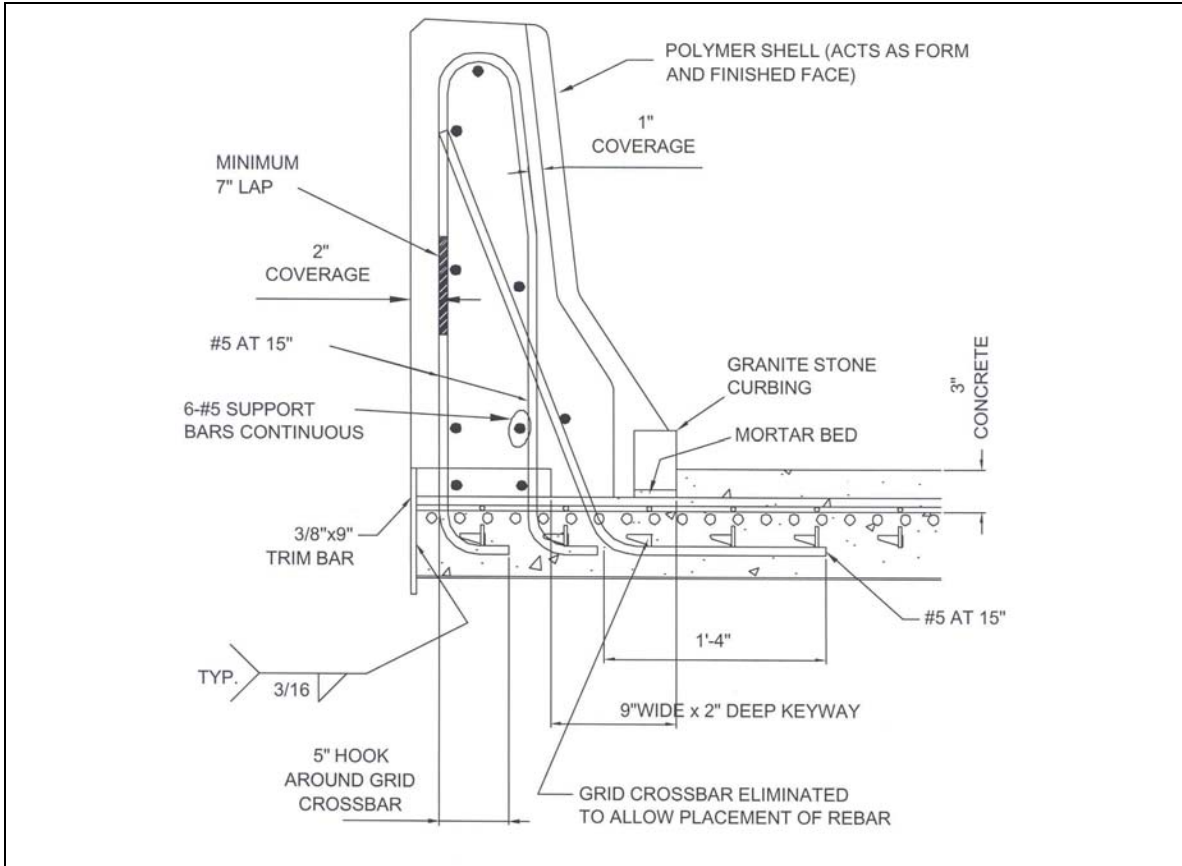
Typical cast in place barrier detail (Exodermic Bridge Deck, Inc., 2003)
